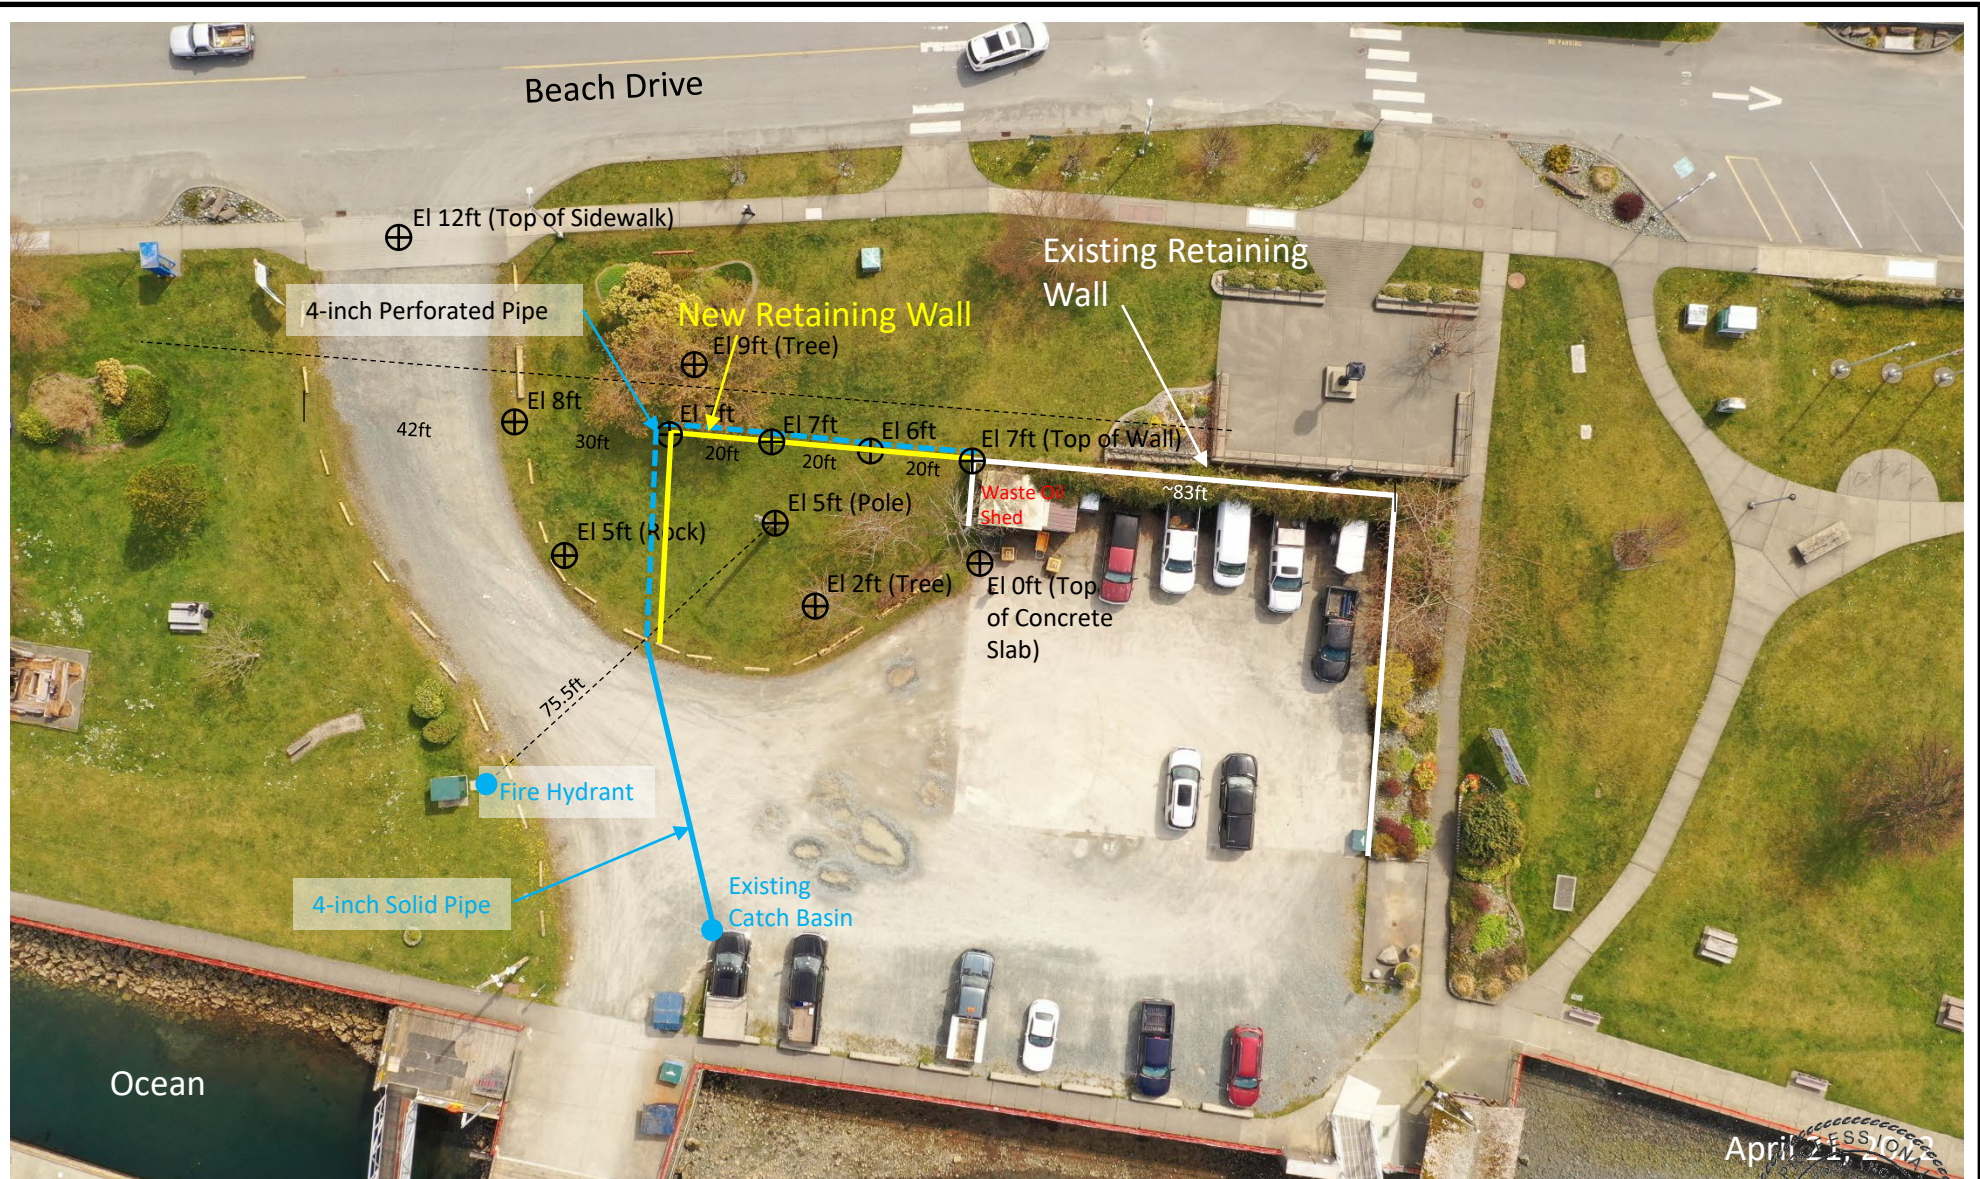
Site Plan showing existing CIP Wall and proposed Lock-Block Wall. Drone Photo April 21, 2022. Elevations of existing ground surface and dimensions shown were surveyed by hand laser and approximate.
